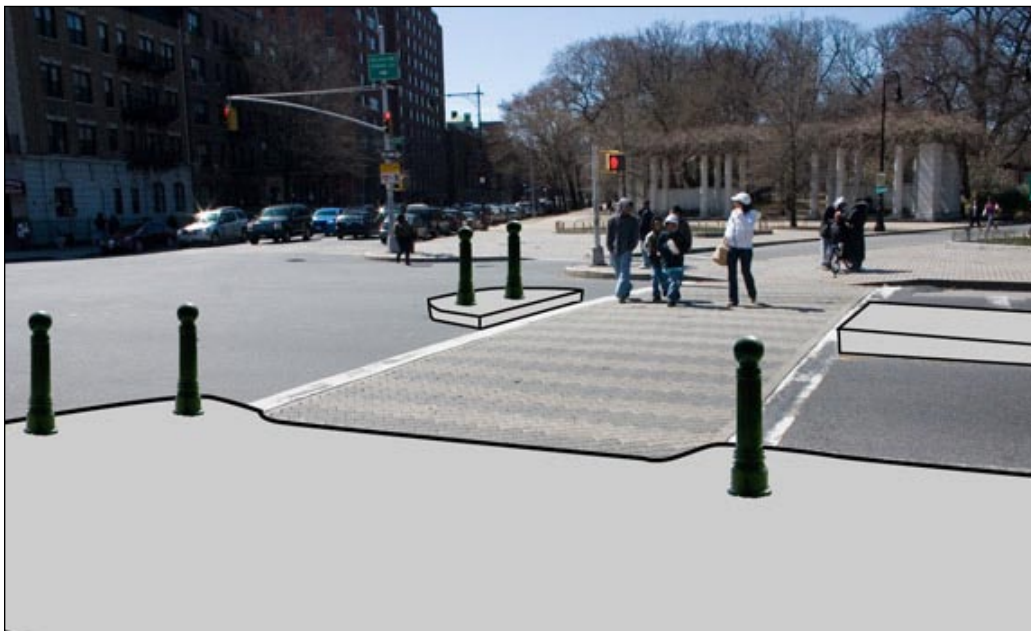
Ocean Avenue at Parkside Avenue with curb extensions, raised median, pedestrian refuge, and bollards to calm traffic, shorten crossing distance and protect pedestrians.
